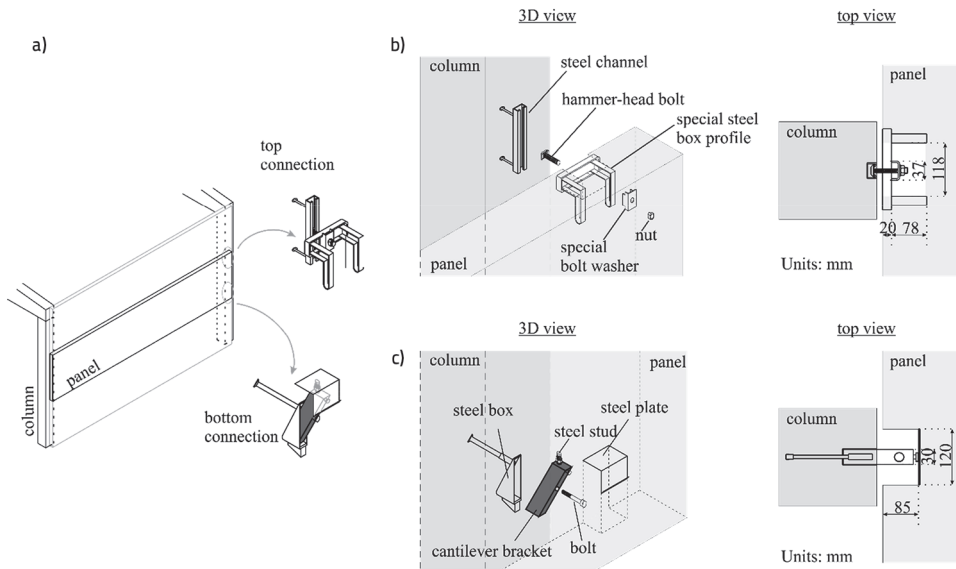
a) Scheme of a typical horizontal panel with cladding connections, b) the assembly of the top bolted connection and c) the assembly of the bottom cantilever connection
